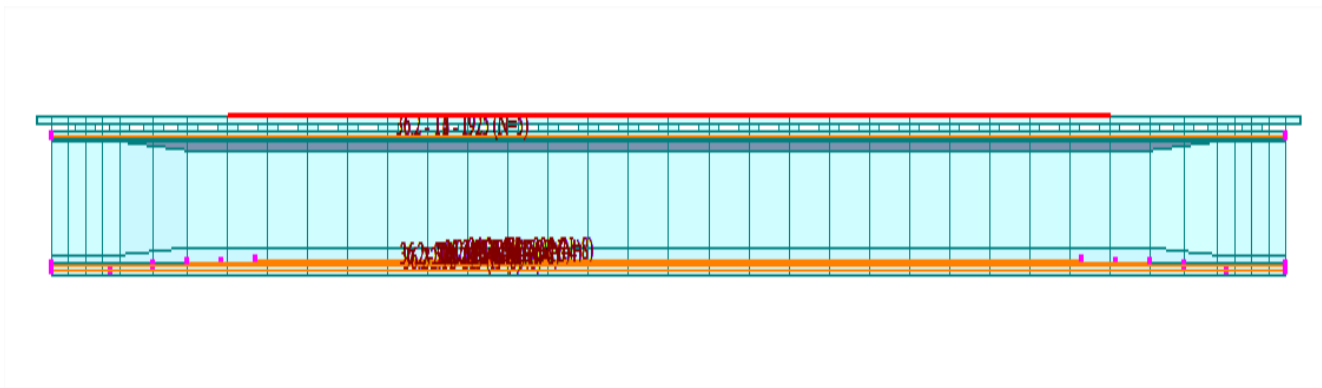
Plan view of 37m Span (6 – T Girder Straight Span)
